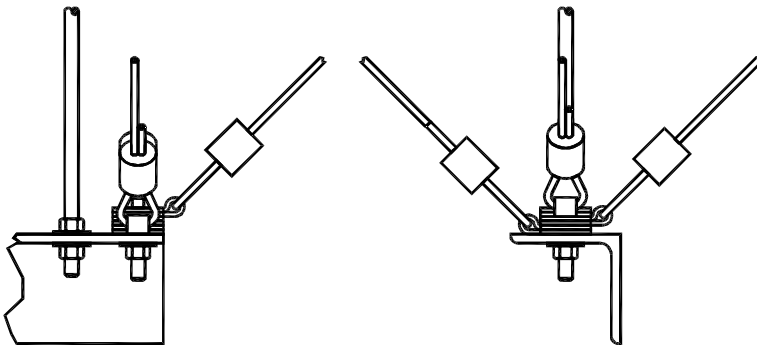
; KSUA Brackets Attached to a Rolled Structural Trapeze Bar –
